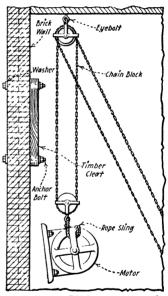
Lifting a motor into position on a wall by placing a sling around the end brackets.
